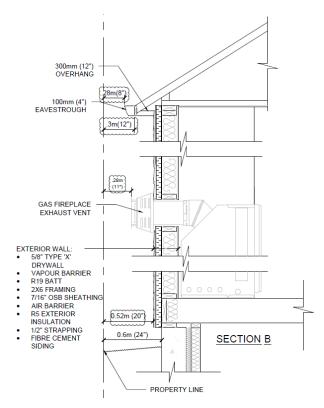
Partial wall section at the 0.6m setback indicated on the site plan.
